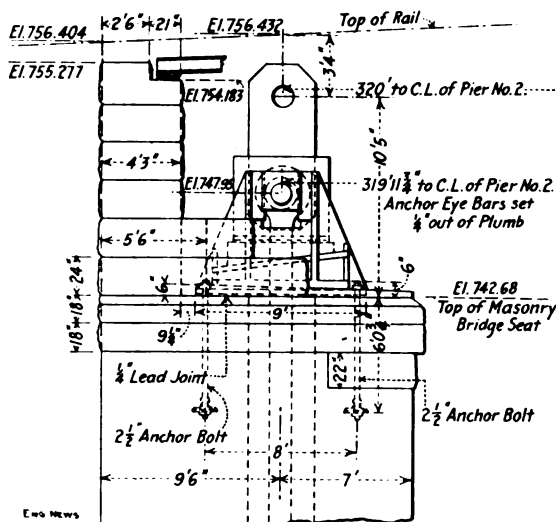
Top of South Abutment, and Position of Wedge Shoe of Anchor Arm.
